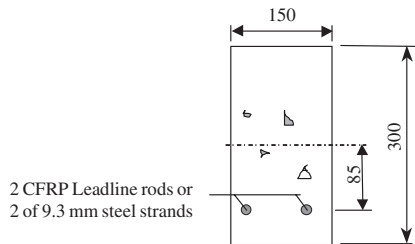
Cross sectional details of 6.4 m long beam with CFRP/steel tendon.
